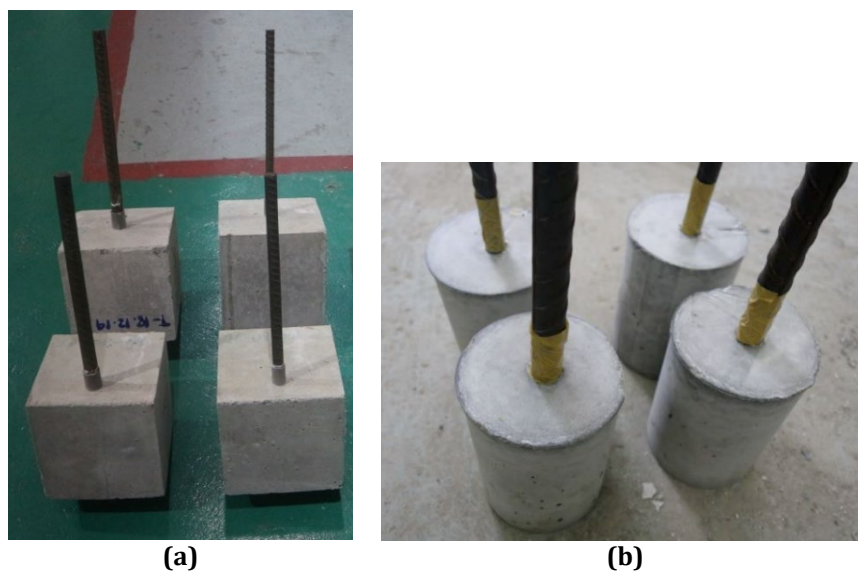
Pullout specimens: (a) cube pullout specimens with 16 mm and 20 mm rebars; and (b) cylinder pullout specimens with 16 mm and 20 mm rebars [19]
